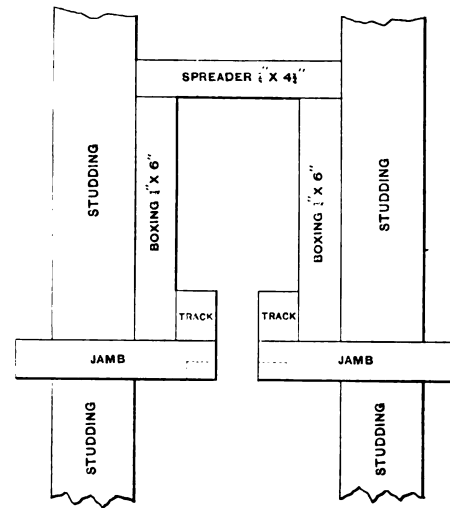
Section showing Construction of Track and Boxing for Sliding Doors.
